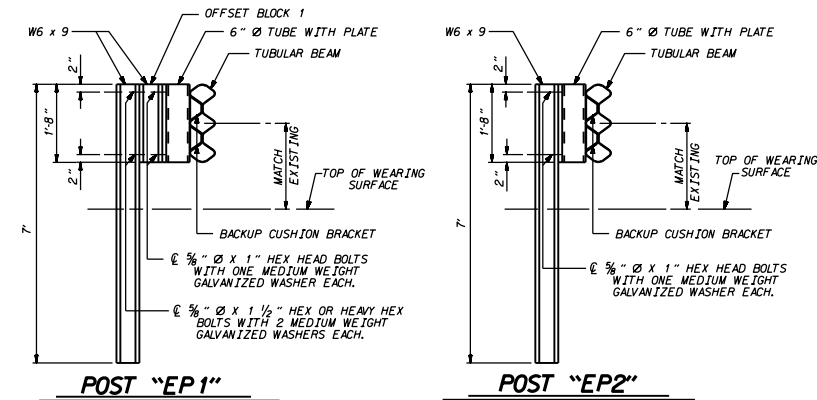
DETAIL SHOWING CONNECTION OF 6" Ø TUBE TO POST OR OFFSET BLOCK
